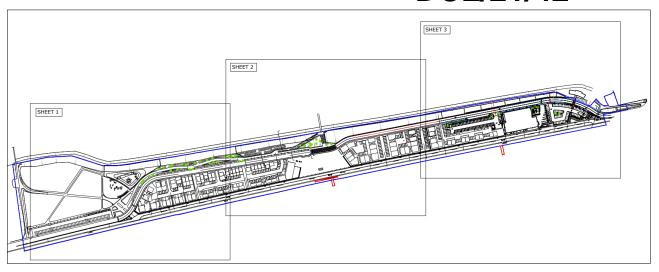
Site Plan showing location of the pipes within the wider site area.
